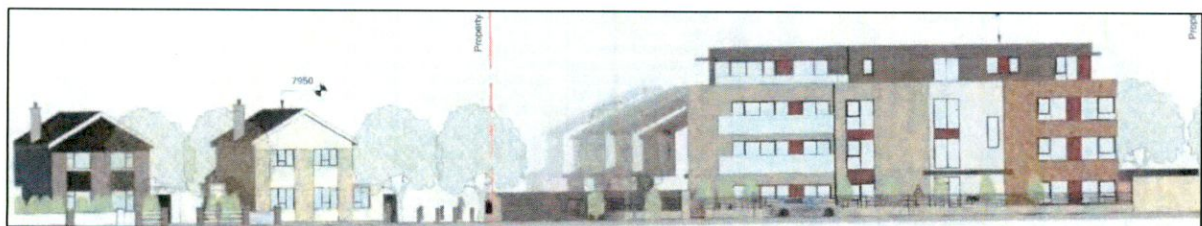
Roadside elevation proposed under Reg. Ref. SD20A/0142, as refused.
